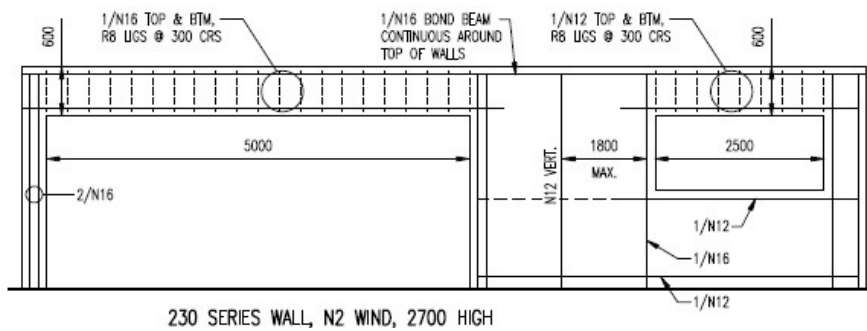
2700 High Wall, N2 Wind Rating, 230 Series ECO-Block (Max. roof load width: 10.0m)
